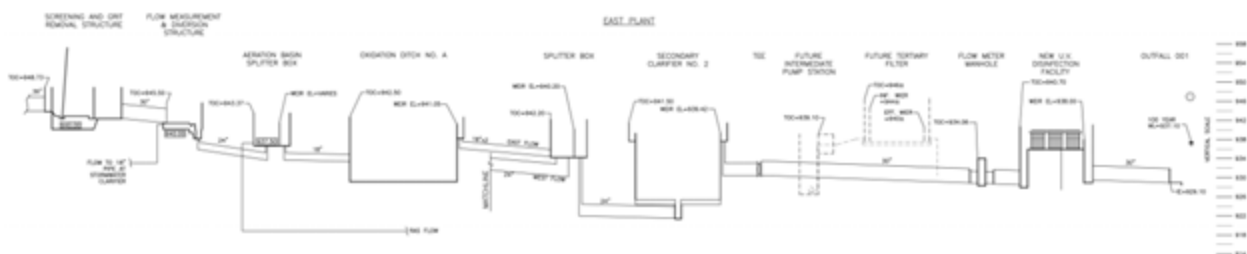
East Plant Dry Weather Hydraulic Profile: Headworks to Flow Diversion Structure
